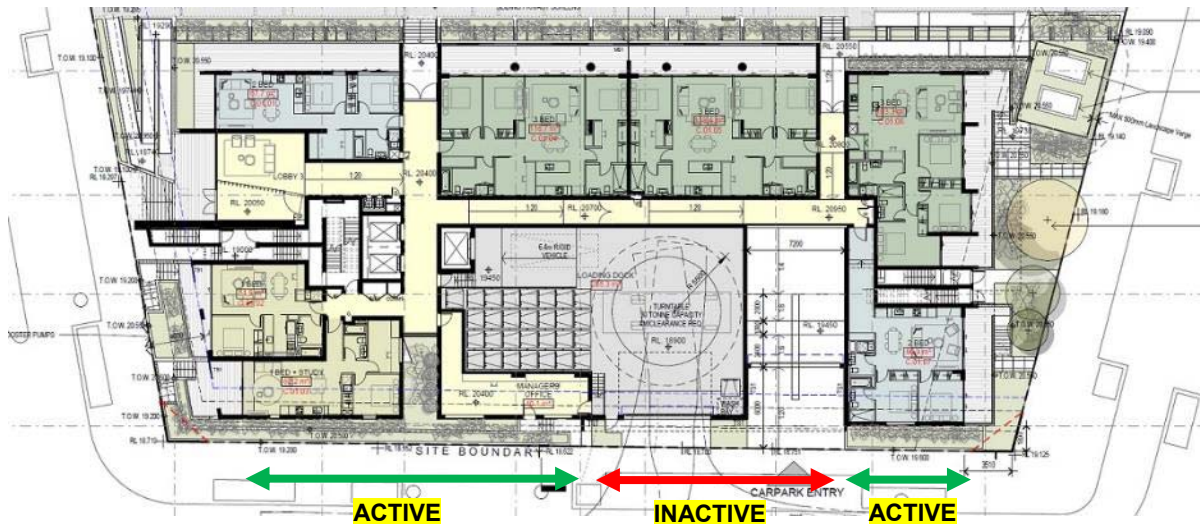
Extract of proposed Sonny Leonard Street floor plan showing active frontage and inactive frontage.
